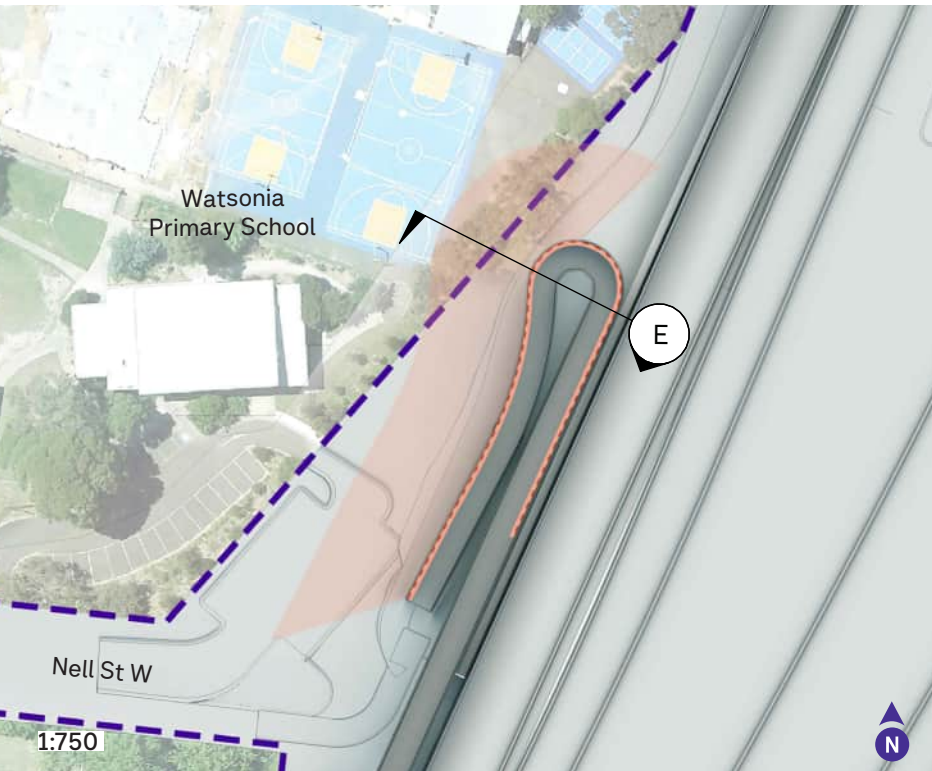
Focus Analysis: Nell Street Shared Use Path Bridge - North Western Ramp Overlooking Analysis Plan - throw screen Type A or B application (no overlooking mitigation)
